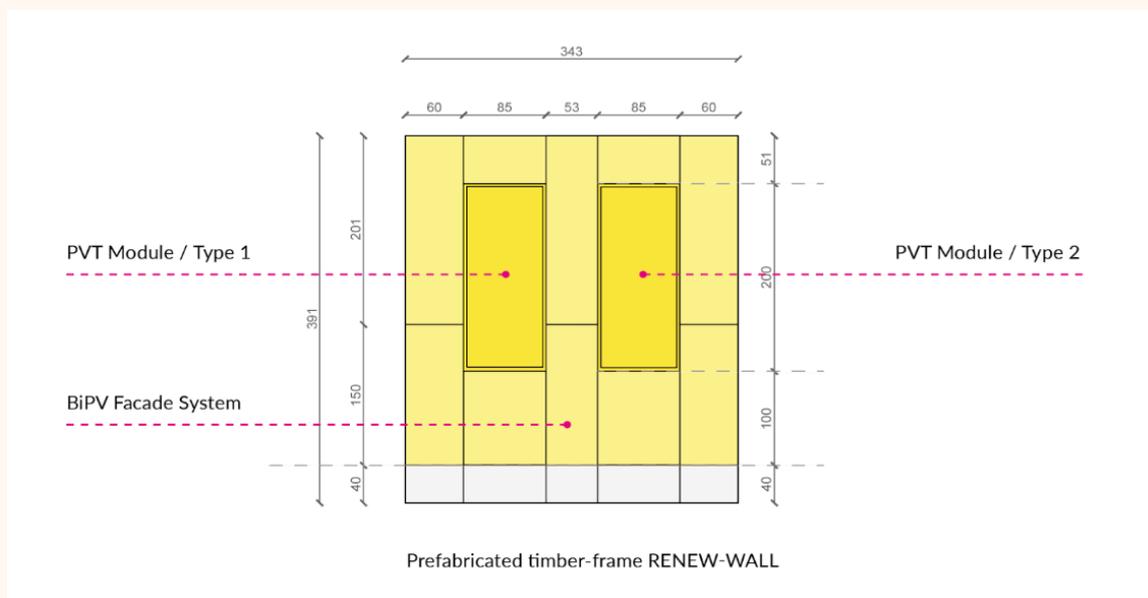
Demo Project Trento, South facade: PVT modules installed in the BIPV facade. Original graphics by Guido Callegari, Politecnico di Torino.
